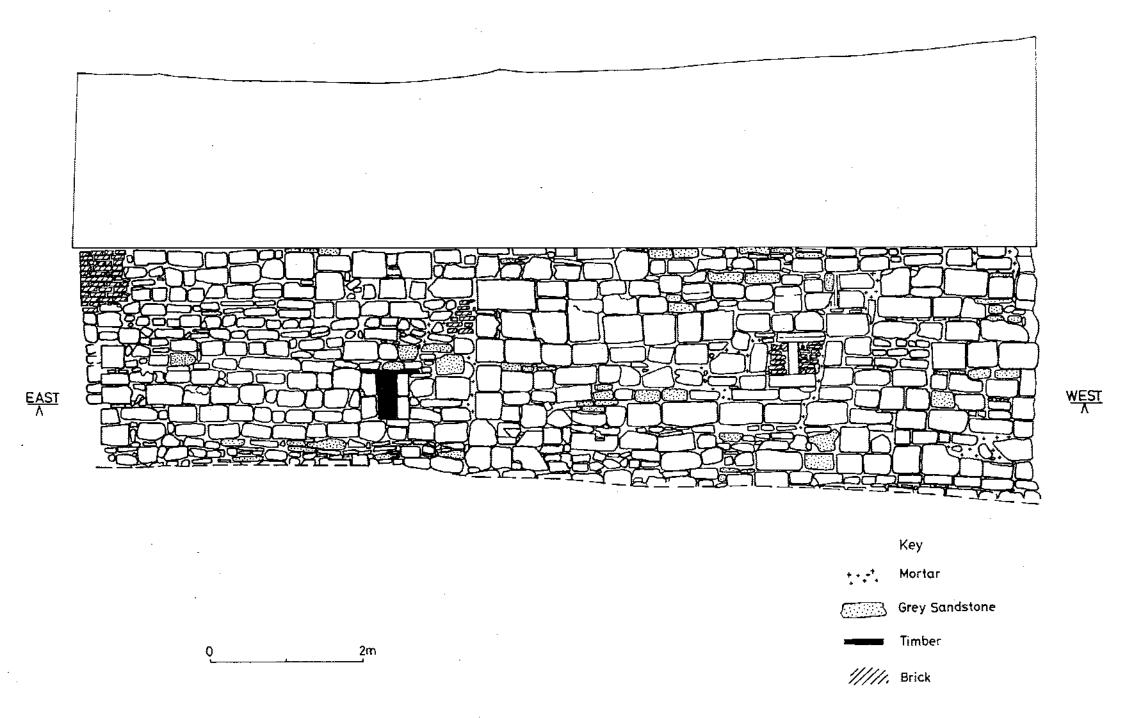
Structure 3. North Wall, Exterior Elevation. (Hodges)
